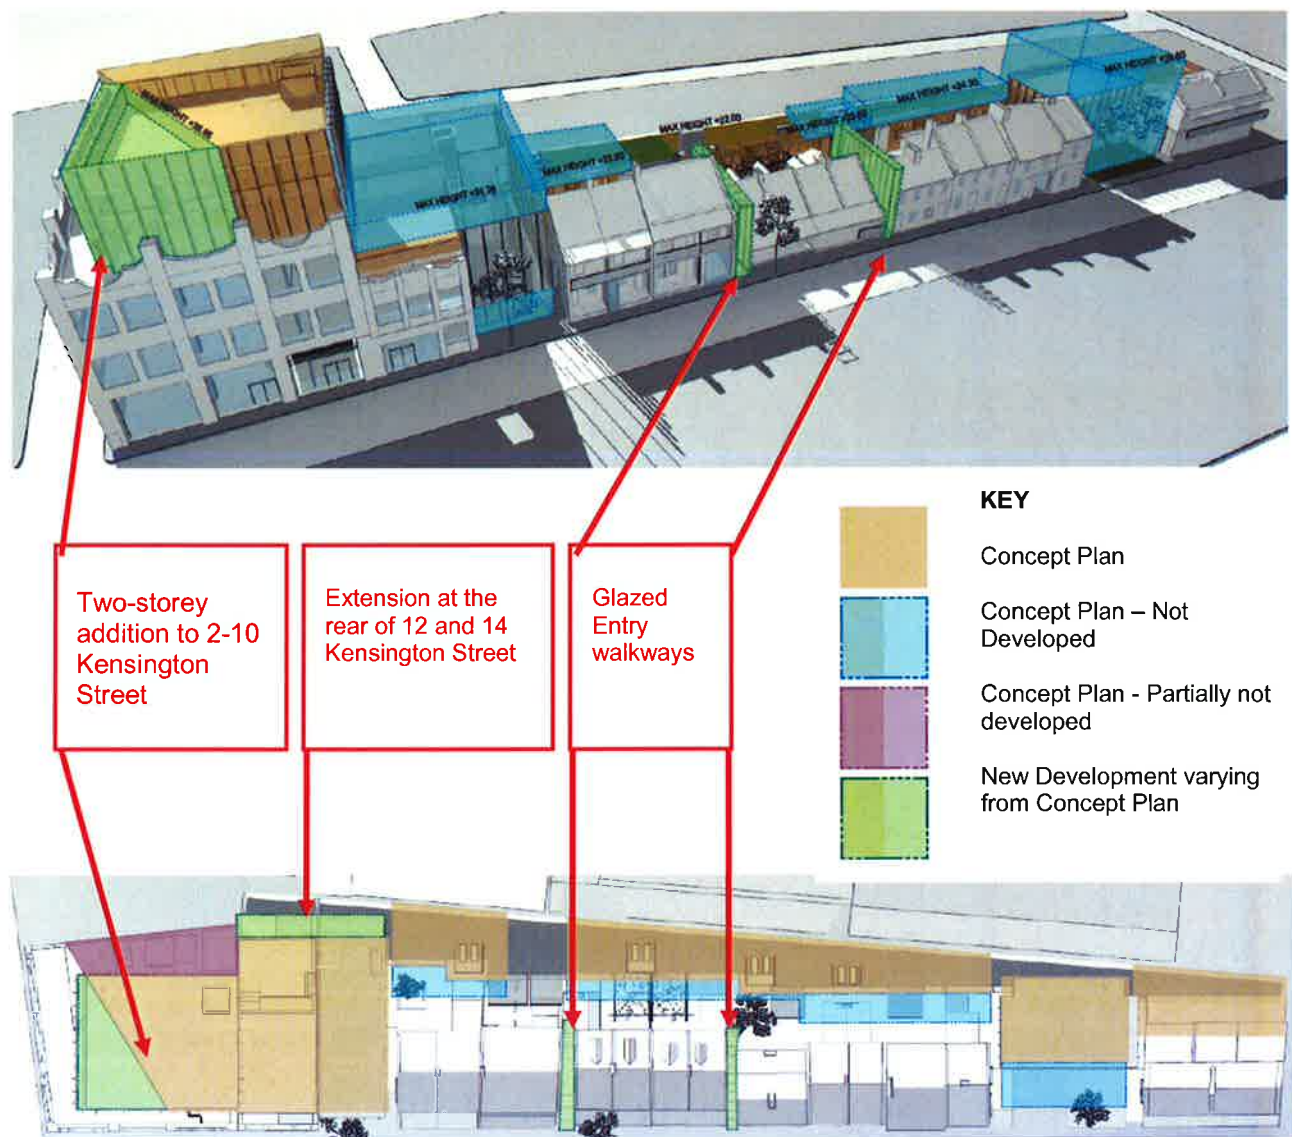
Concept Plan Analysis 3D perspective and plan view (source: TZG)
